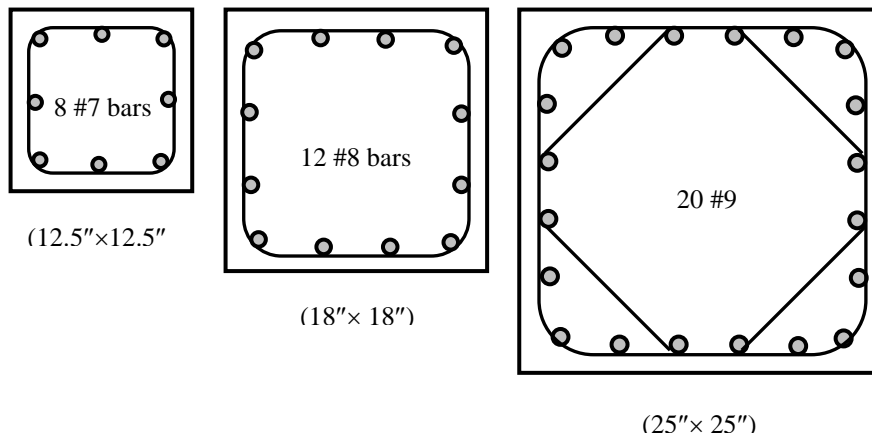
Column Sections of 6-, 12- and 24-storied buildings
